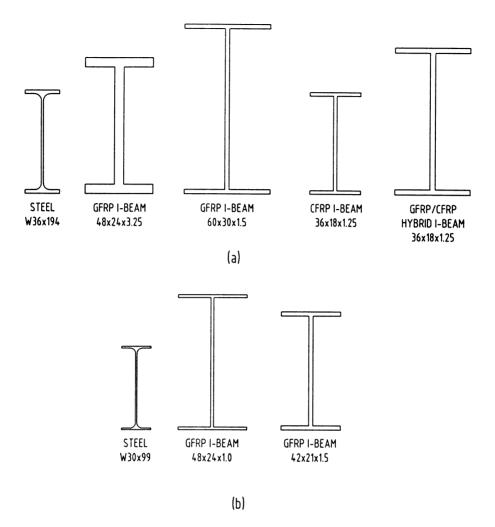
Comparison of different beams for a two-lane 16.80-m-span bridge, with a total of five beams spaced at 2.30 m, and a 180-mm-thick concrete slab. (a) Noncomposite action between beams and slab; (b) composite action between beams and slabs.
